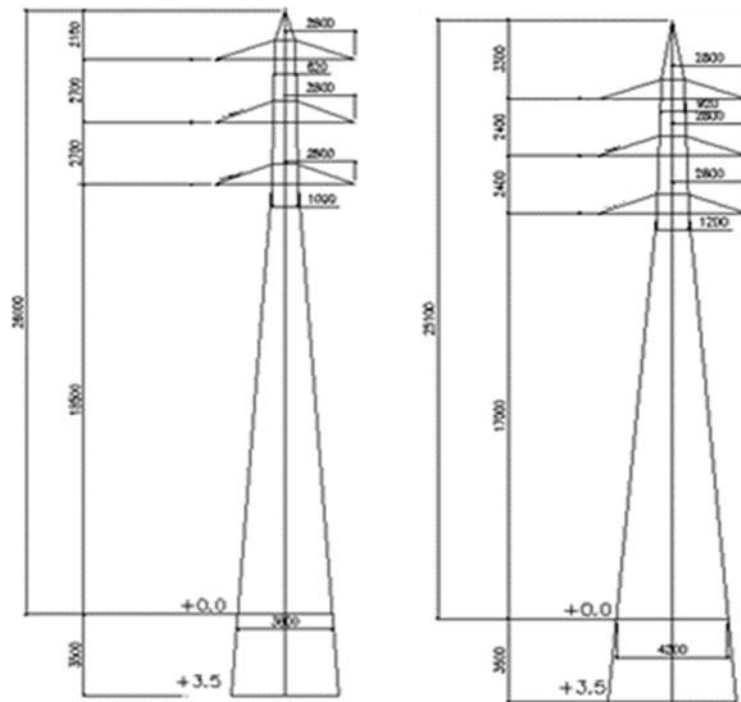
Type of tower structure proposed to use in 60 kV TL Project (suspension and tension).
